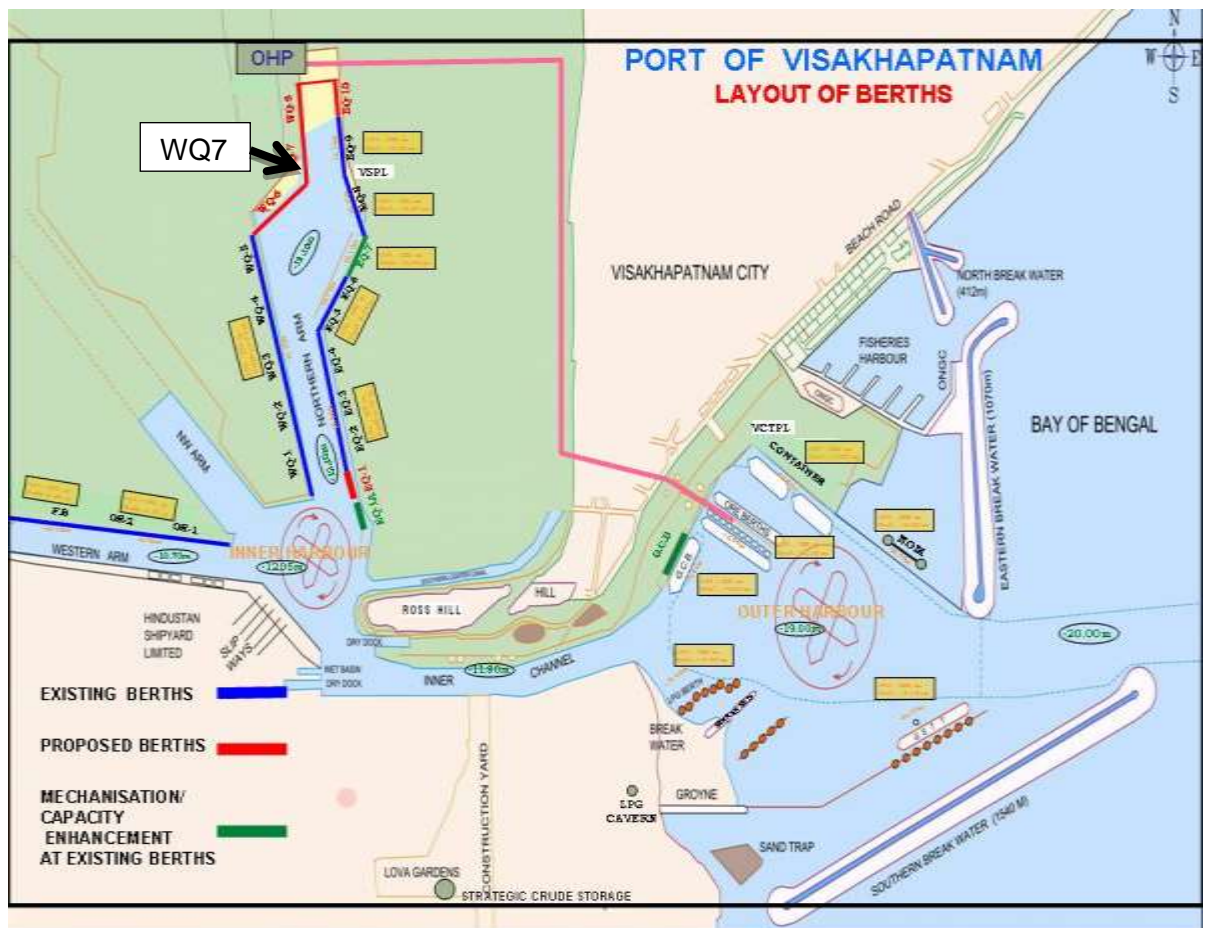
Layout details of West Quay North (WQ-7 & WQ-8)
